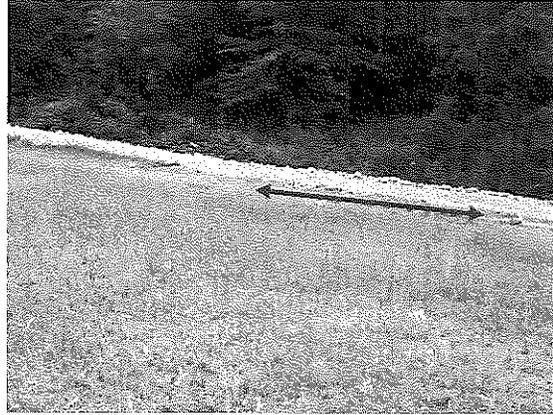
Area not sufficiently stabilized at rock berm at Sta. 132+00
